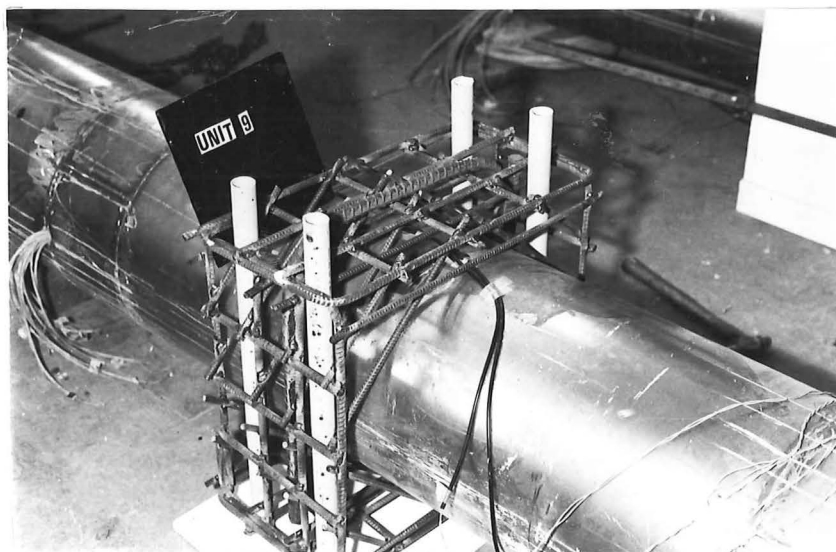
TYPICAL CONCRETE LOADING BLOCK REINFORCEMENT
